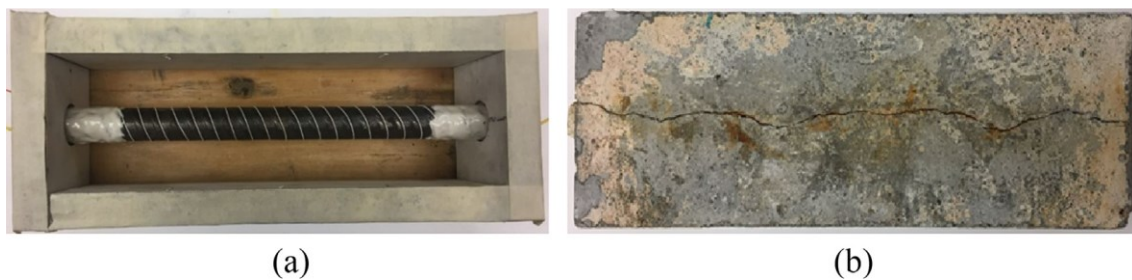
Reinforced concrete beams: (a) before concrete casting; (b) after the accelerated corrosion test (Fan et al. 2020)
